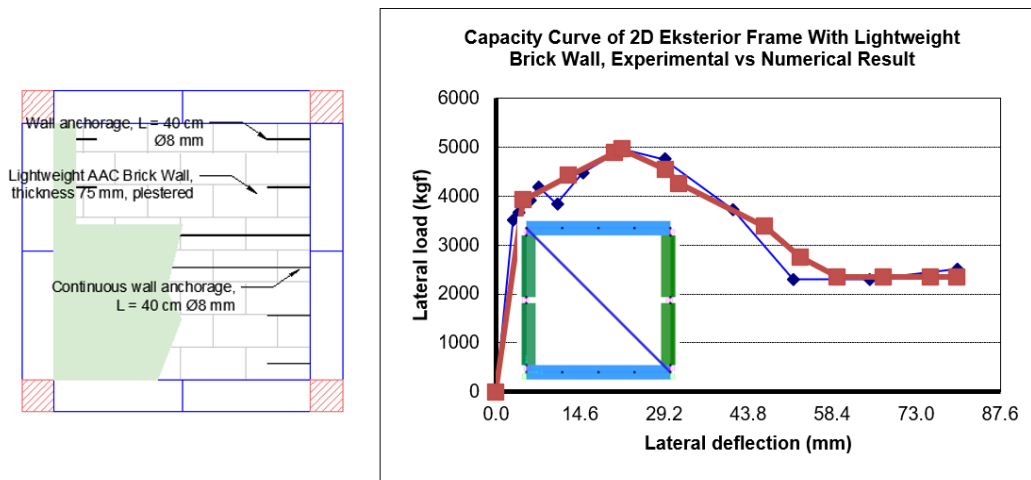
Compression strut element calibration for lightweight brick wall modeling.
